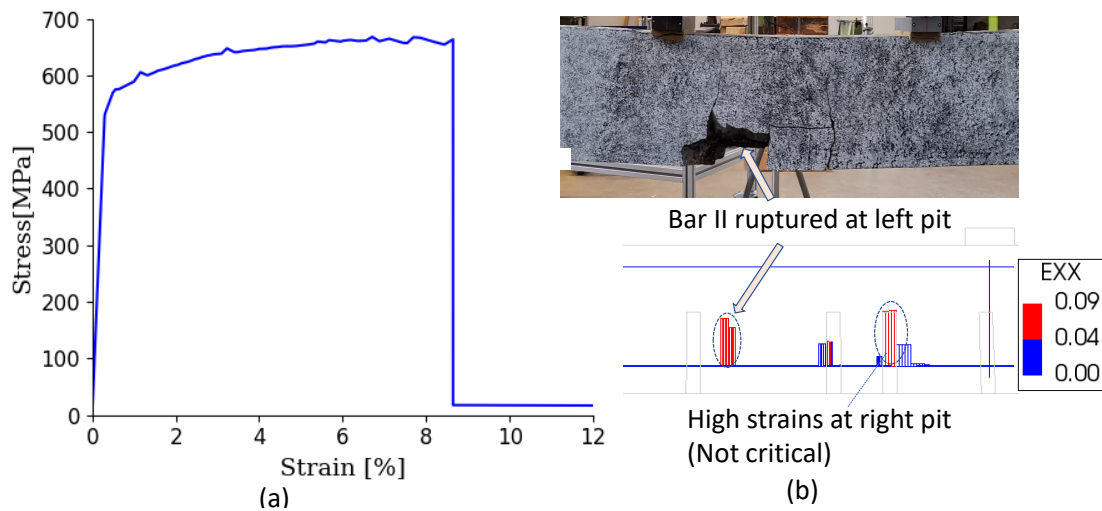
The stress versus strain for tensile bar II at the critical pit of DN1 beam: (a) stress versus strain at left pit which initiated failure of the beam, (b) reinforcement element with high strain which initiated failure of the beam due to rupture, photo from experiment shows failure due to rupture of corroded tensile rebar.
